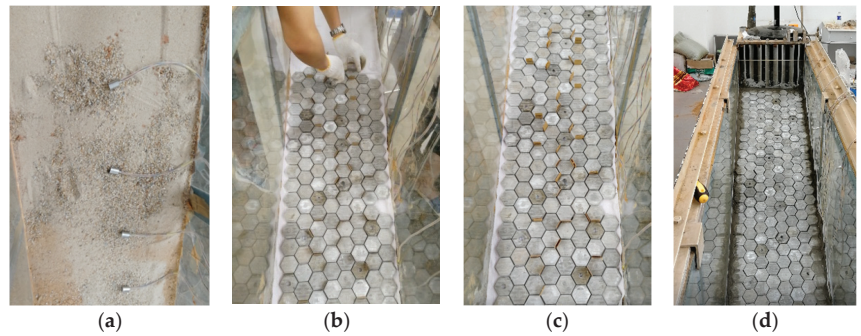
The laying process of precast concrete blocks. (a) Placing the sensors. (b) Laying the precast blocks. (c) Paving seam arrangement. (d) Finished model.
